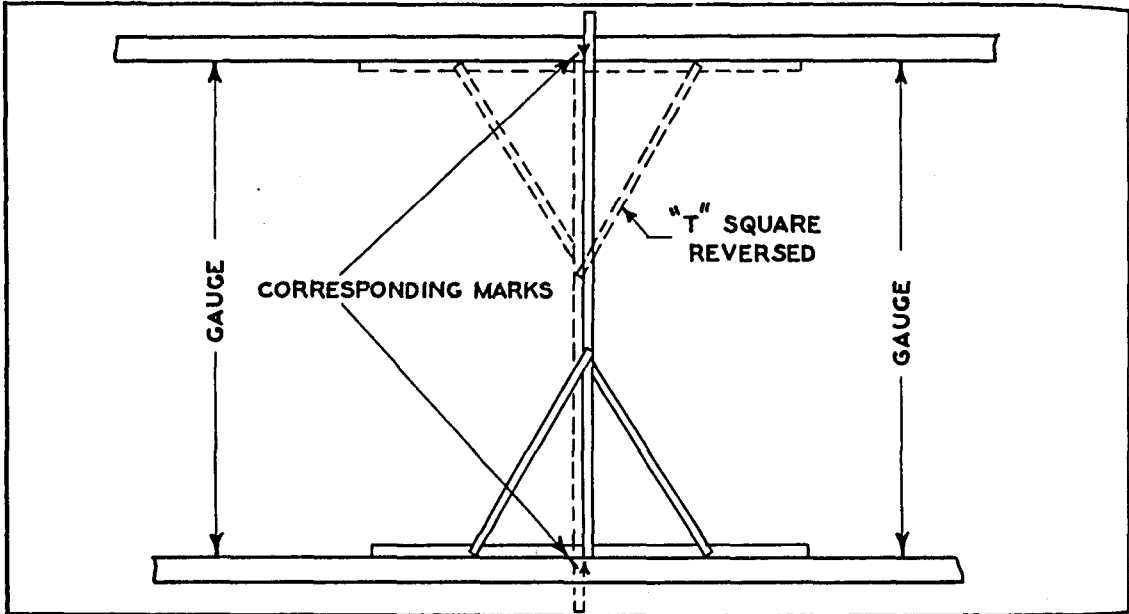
A METHOD OF CHECKING "T" SQUARES.
